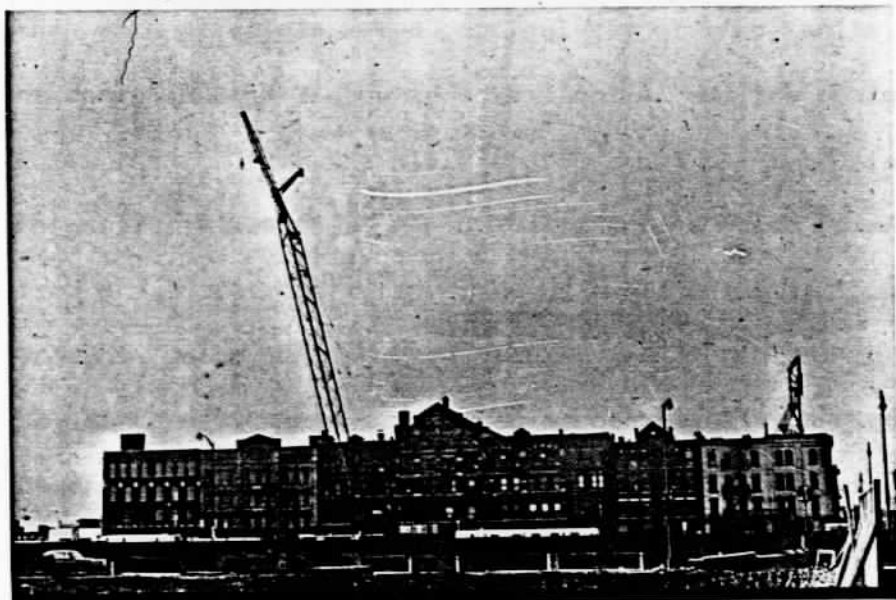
West Water Street, view north, showing Amos Block as part of a row of buildings (OHA, photo by Lorenz, April 1973).
